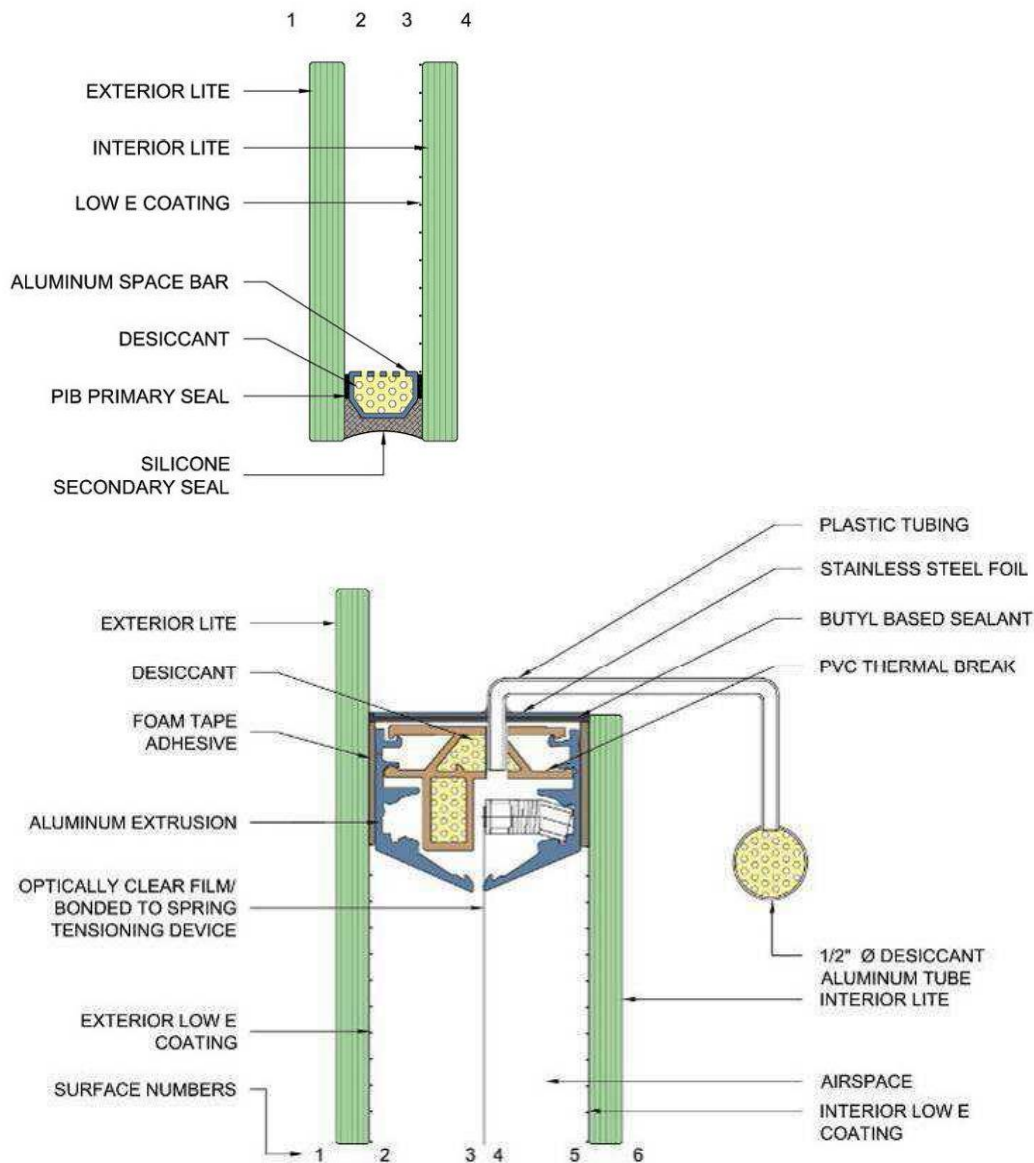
Conventional and Visionwall IGU Edge Seal Construction
